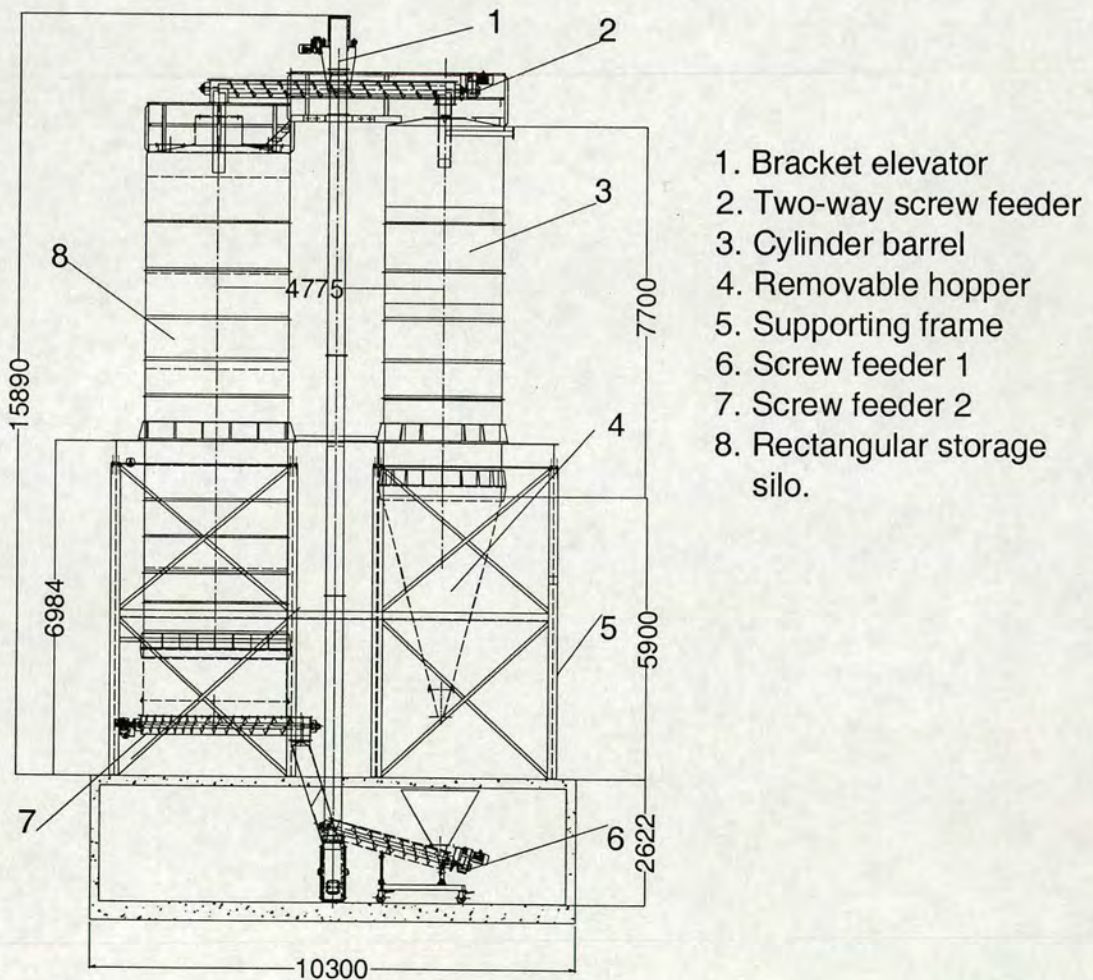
Full scale silo test facility (dimensions in mm)
